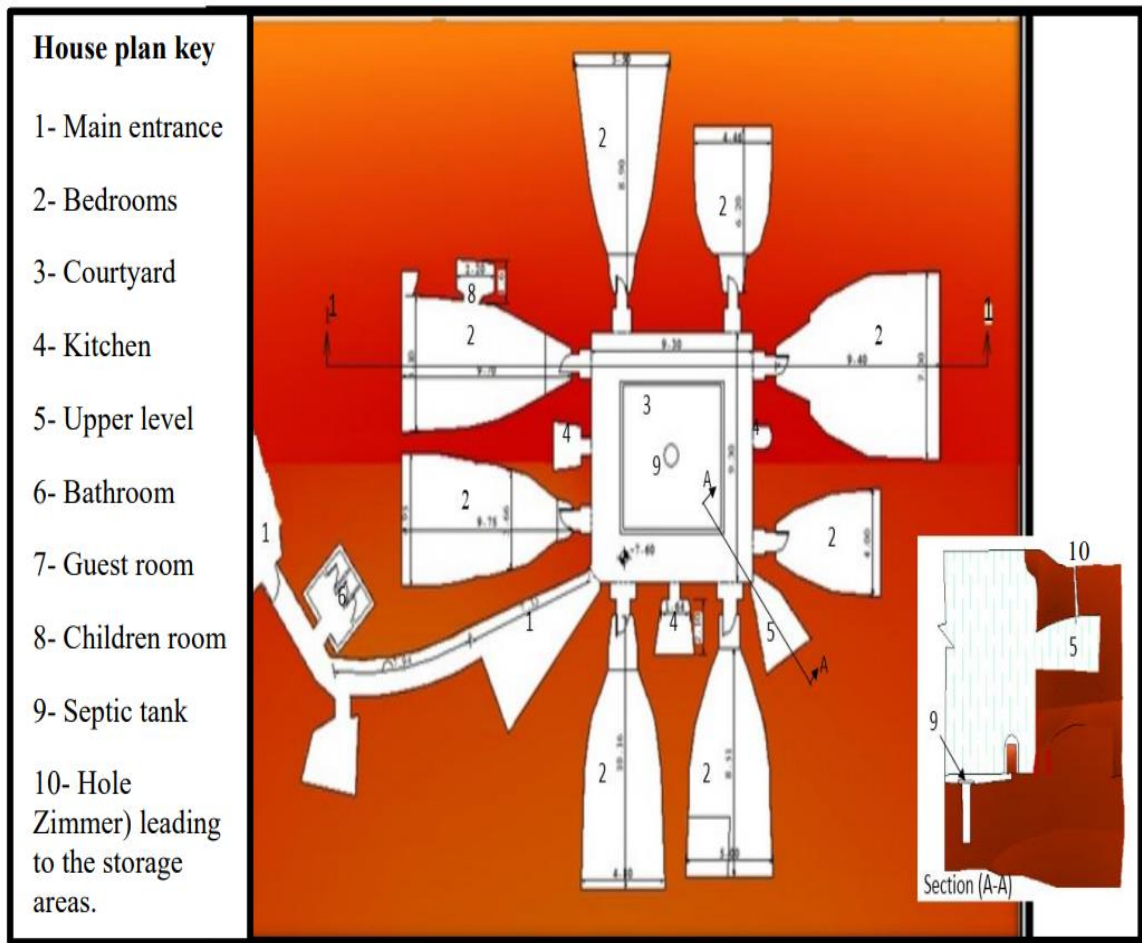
Plan and cross-section of an underground dwelling in Gharyan
